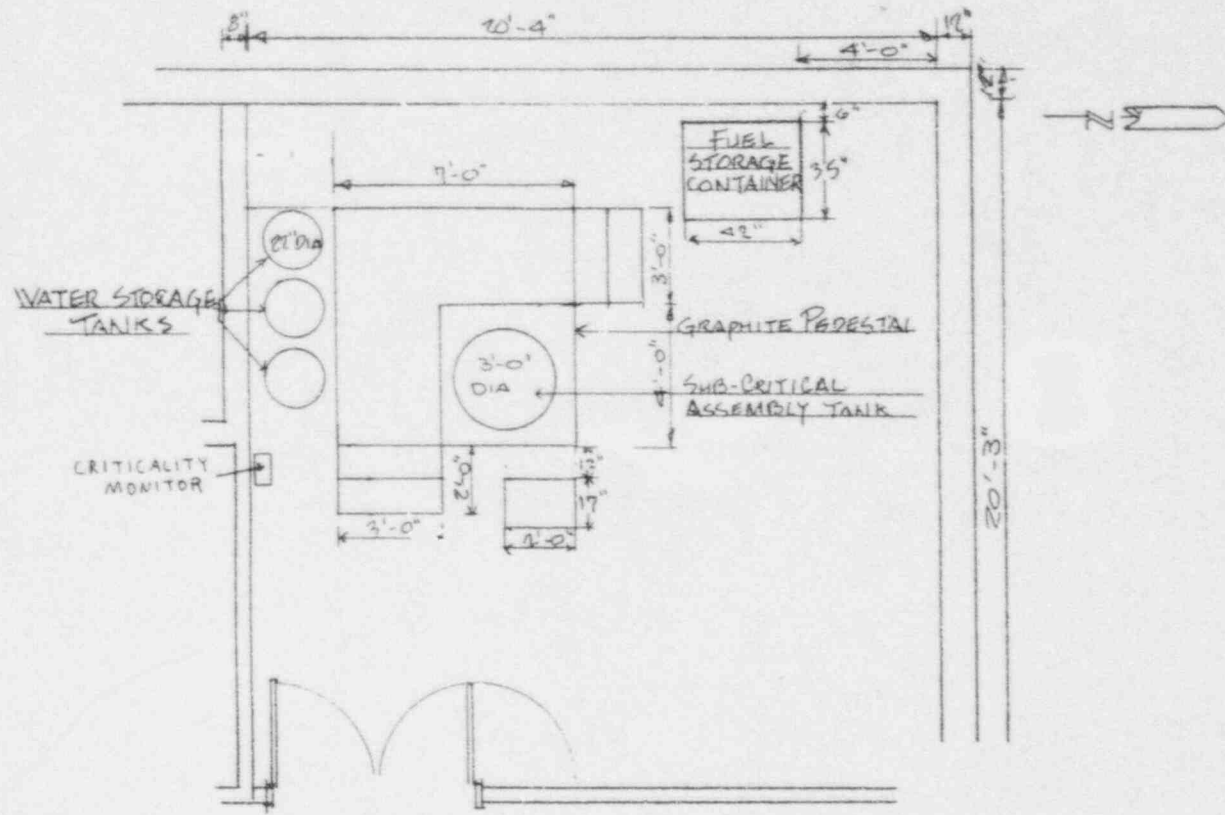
Sub-critical assembly laboratory floor plan (basement)
